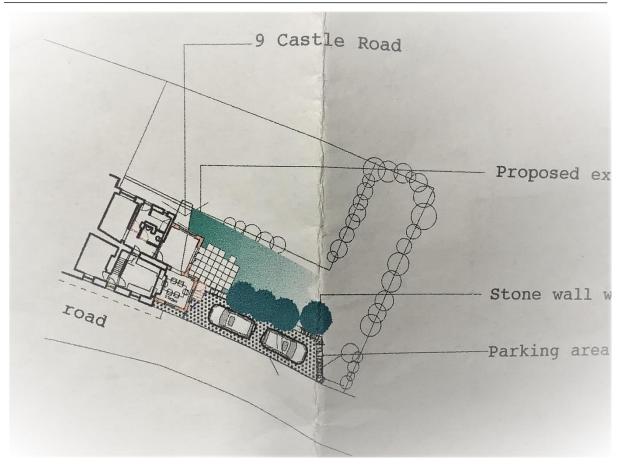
Plans for the extension of parking space as well as future building extensions.
